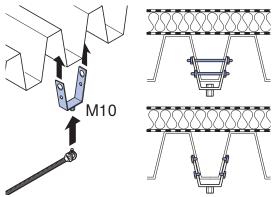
Fastening Geberit Pluvia support sets on a trapezoidal roof using profile hangers
